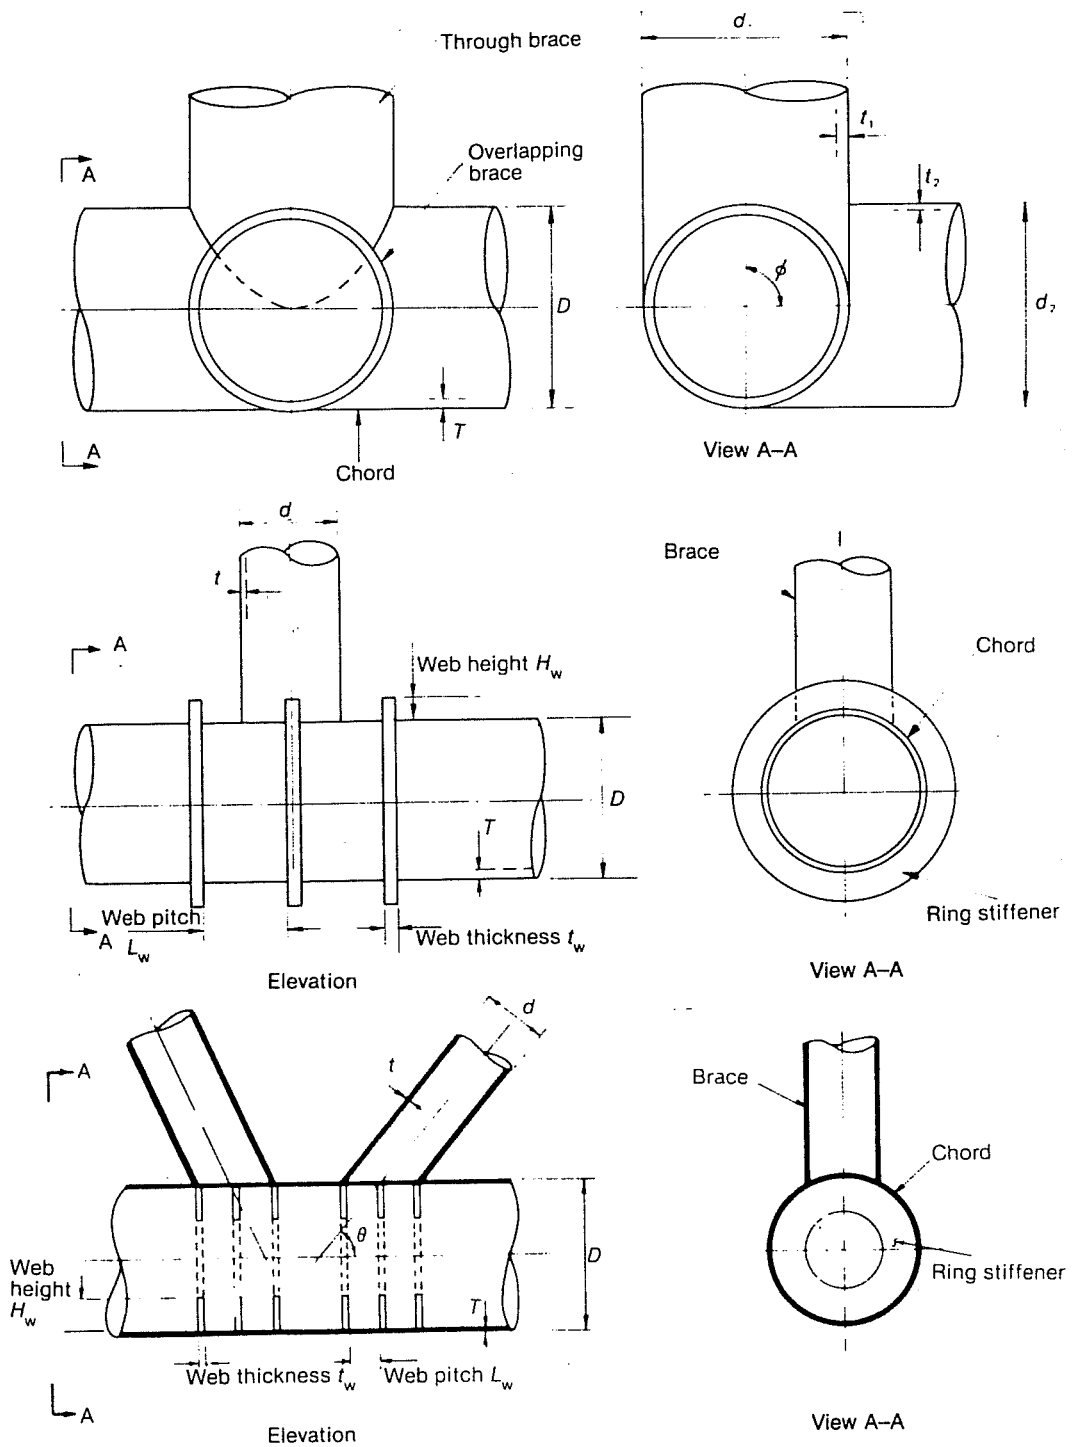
Example of Complex Welded Tubular Joint
